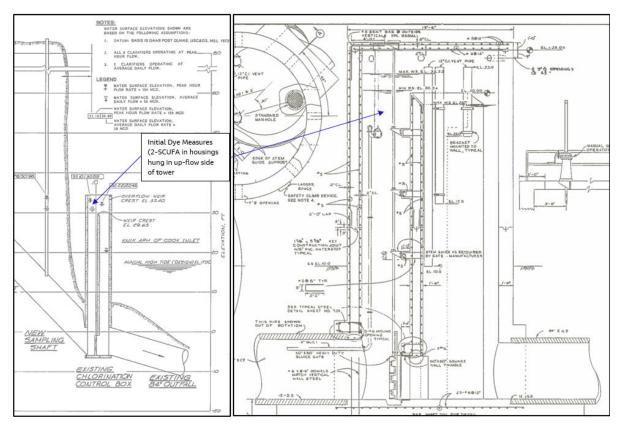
Sectional Drawings of the Outfall Chlorination Tower and the Initial Dye Measurements Site
